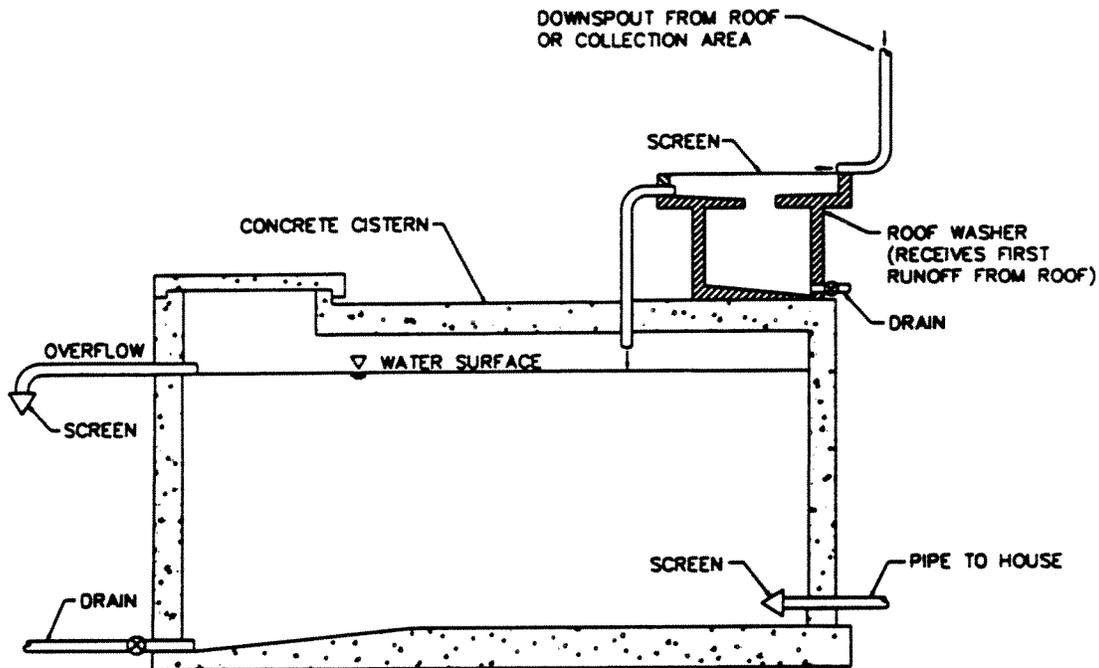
Rainwater Holding Facility with First Flow Diversion
